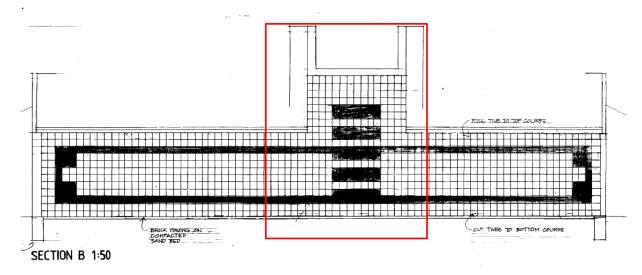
Approximate location of new lift from subway level requiring partial demolition of wall.
